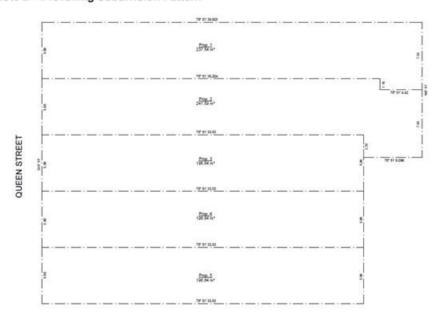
Proposed lot subdivision plan from two (2) lots to five (5) lots
